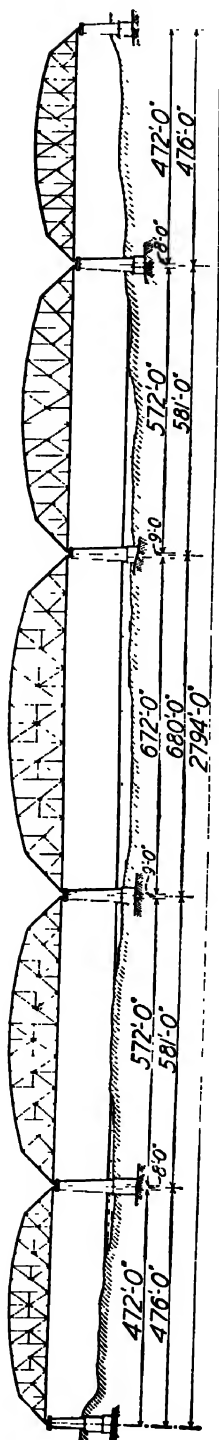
Alternative Layout for Proposed Bridge over the Mississippi River at Thebes, Ill.
